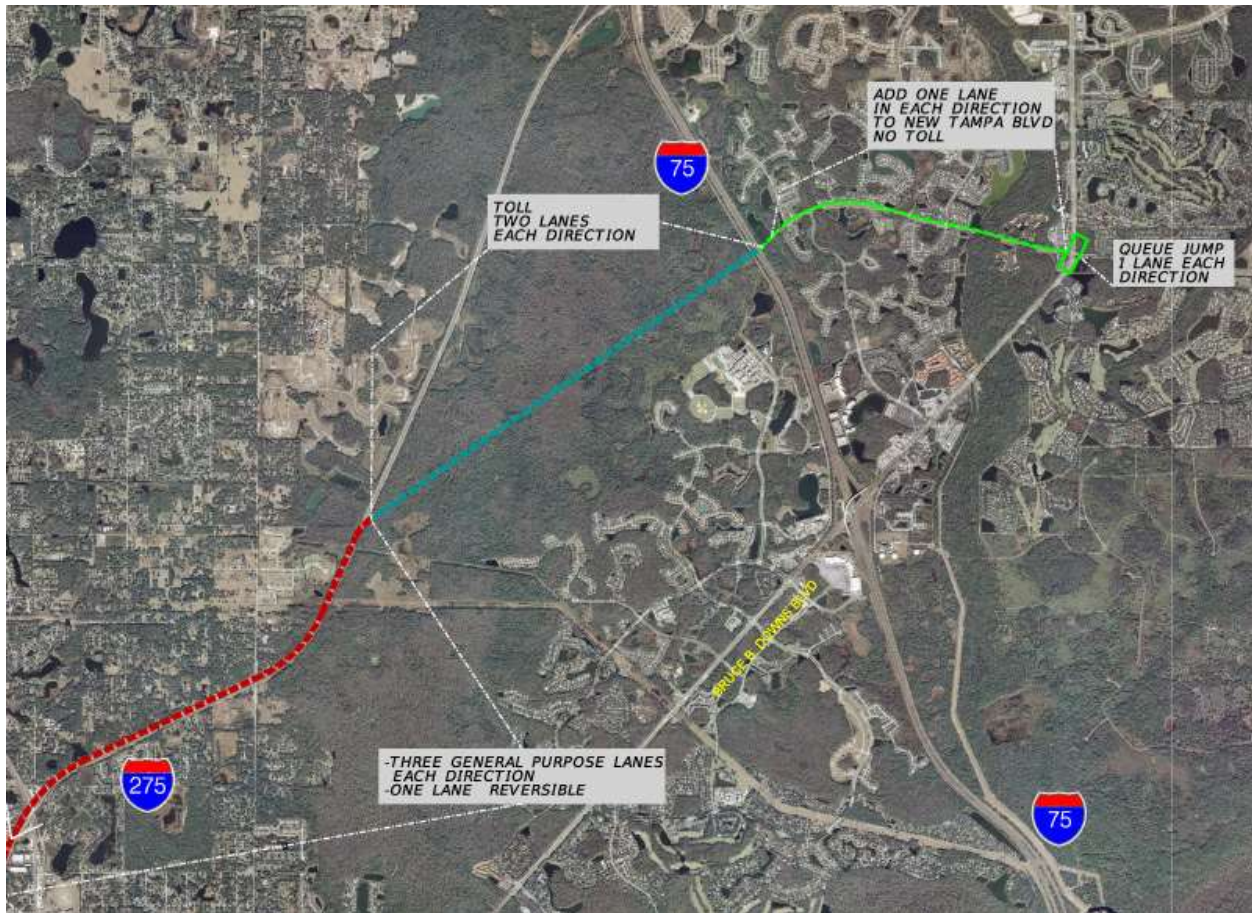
BTL#3 I-275 North BTL Connection to East-West Road and New Tampa Boulevard (Source: Parsons Brinckerhoff)
